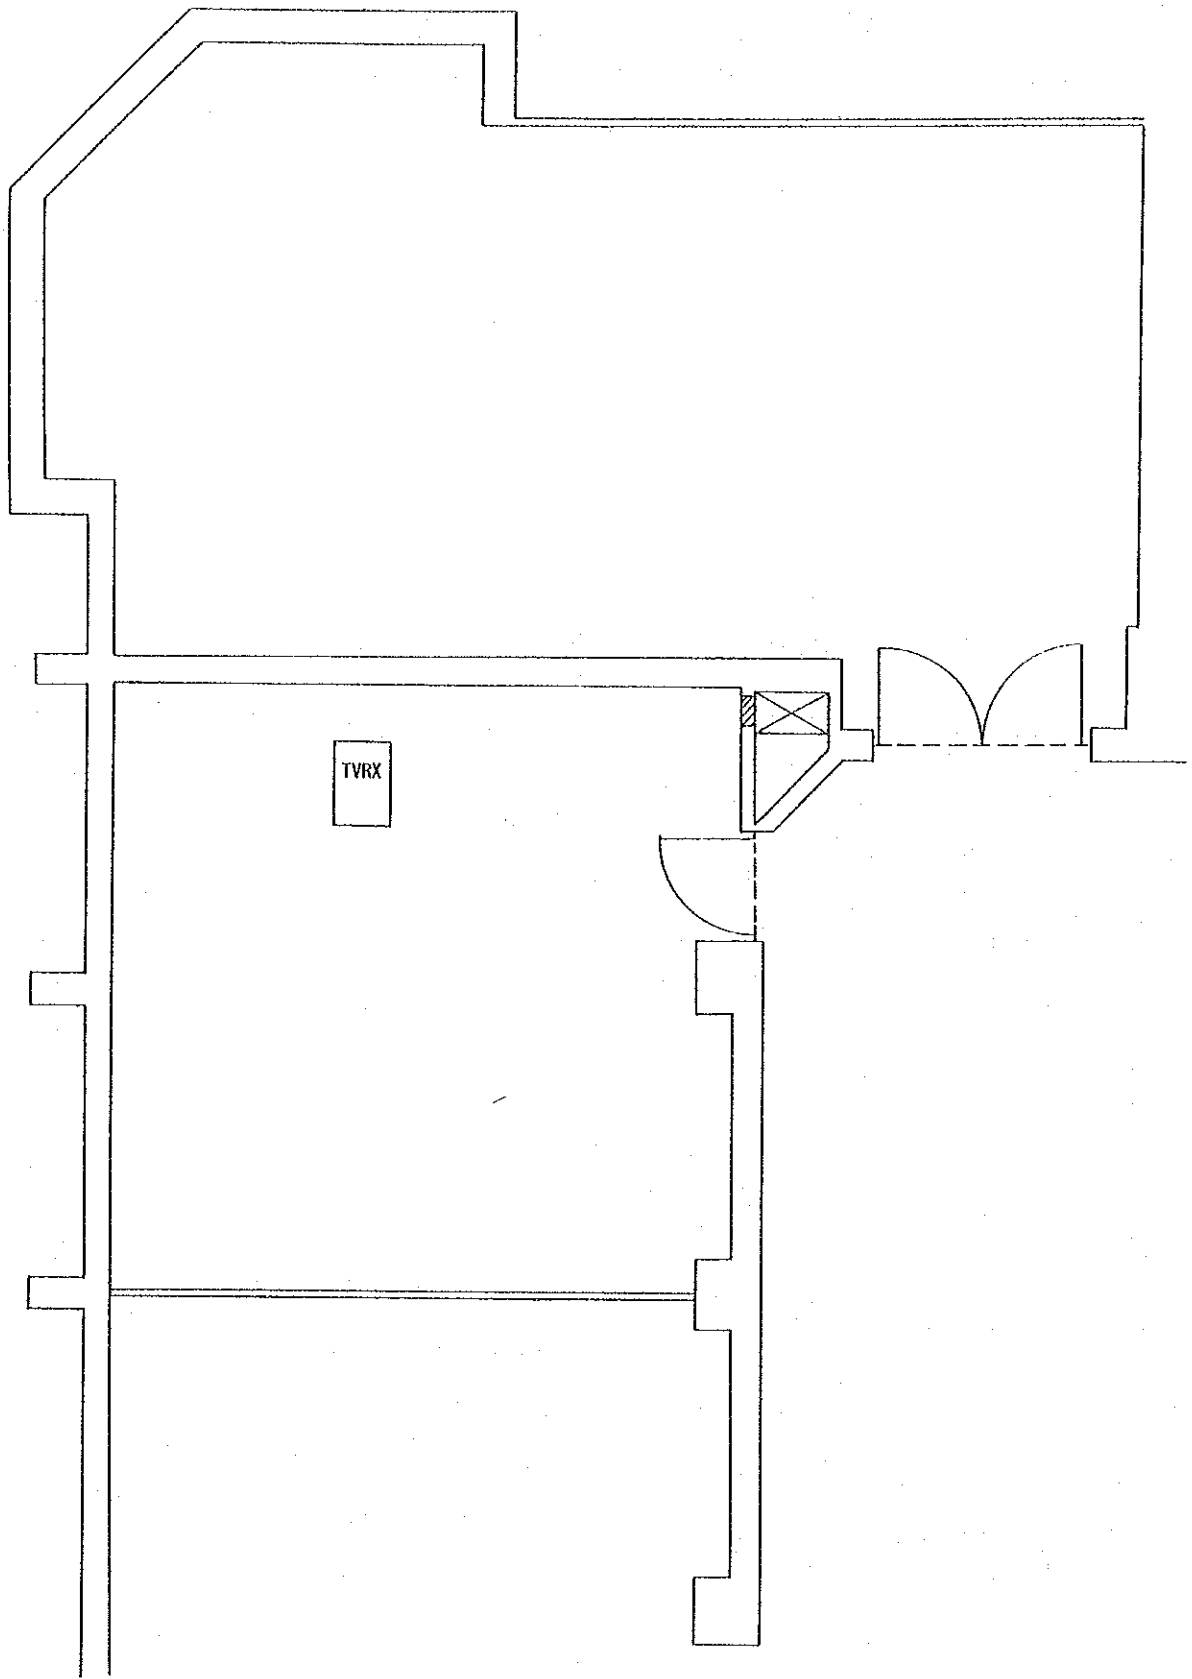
Equipment Layout Plan in TV Reception Earth Station Room
